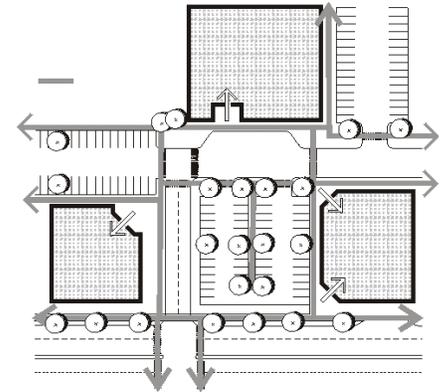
An example of an integrated pedestrian circulation system. Note the connections from the street, between buildings, through parking lots, and to adjacent sites.
